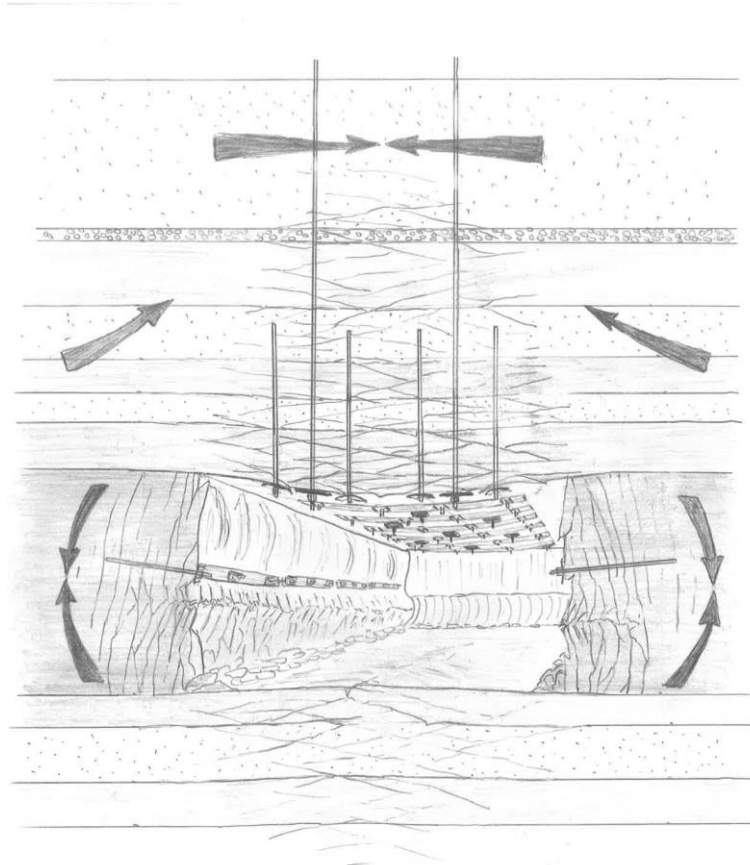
Sketch of deformation and stress redistribution in rock masses around an excavation reinforced by rock bolts and cable bolts (Nemcik *et al.*, 2009)
